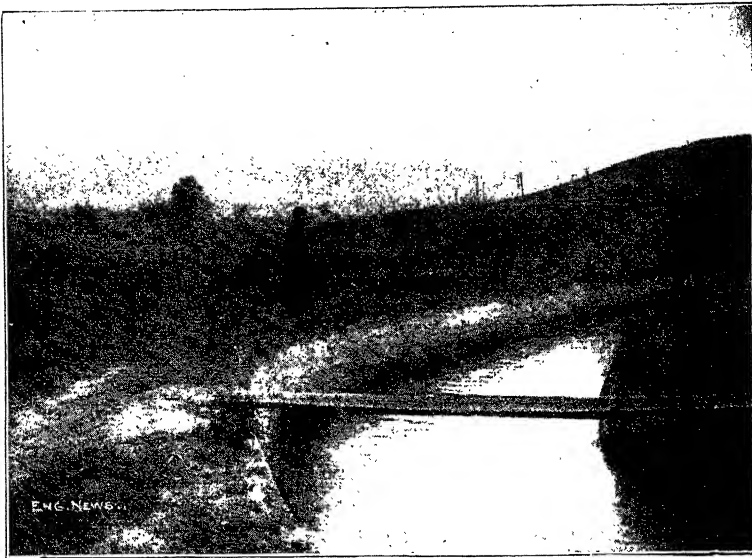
Santa Ana Canal, California, with Gravel Concrete Lining
